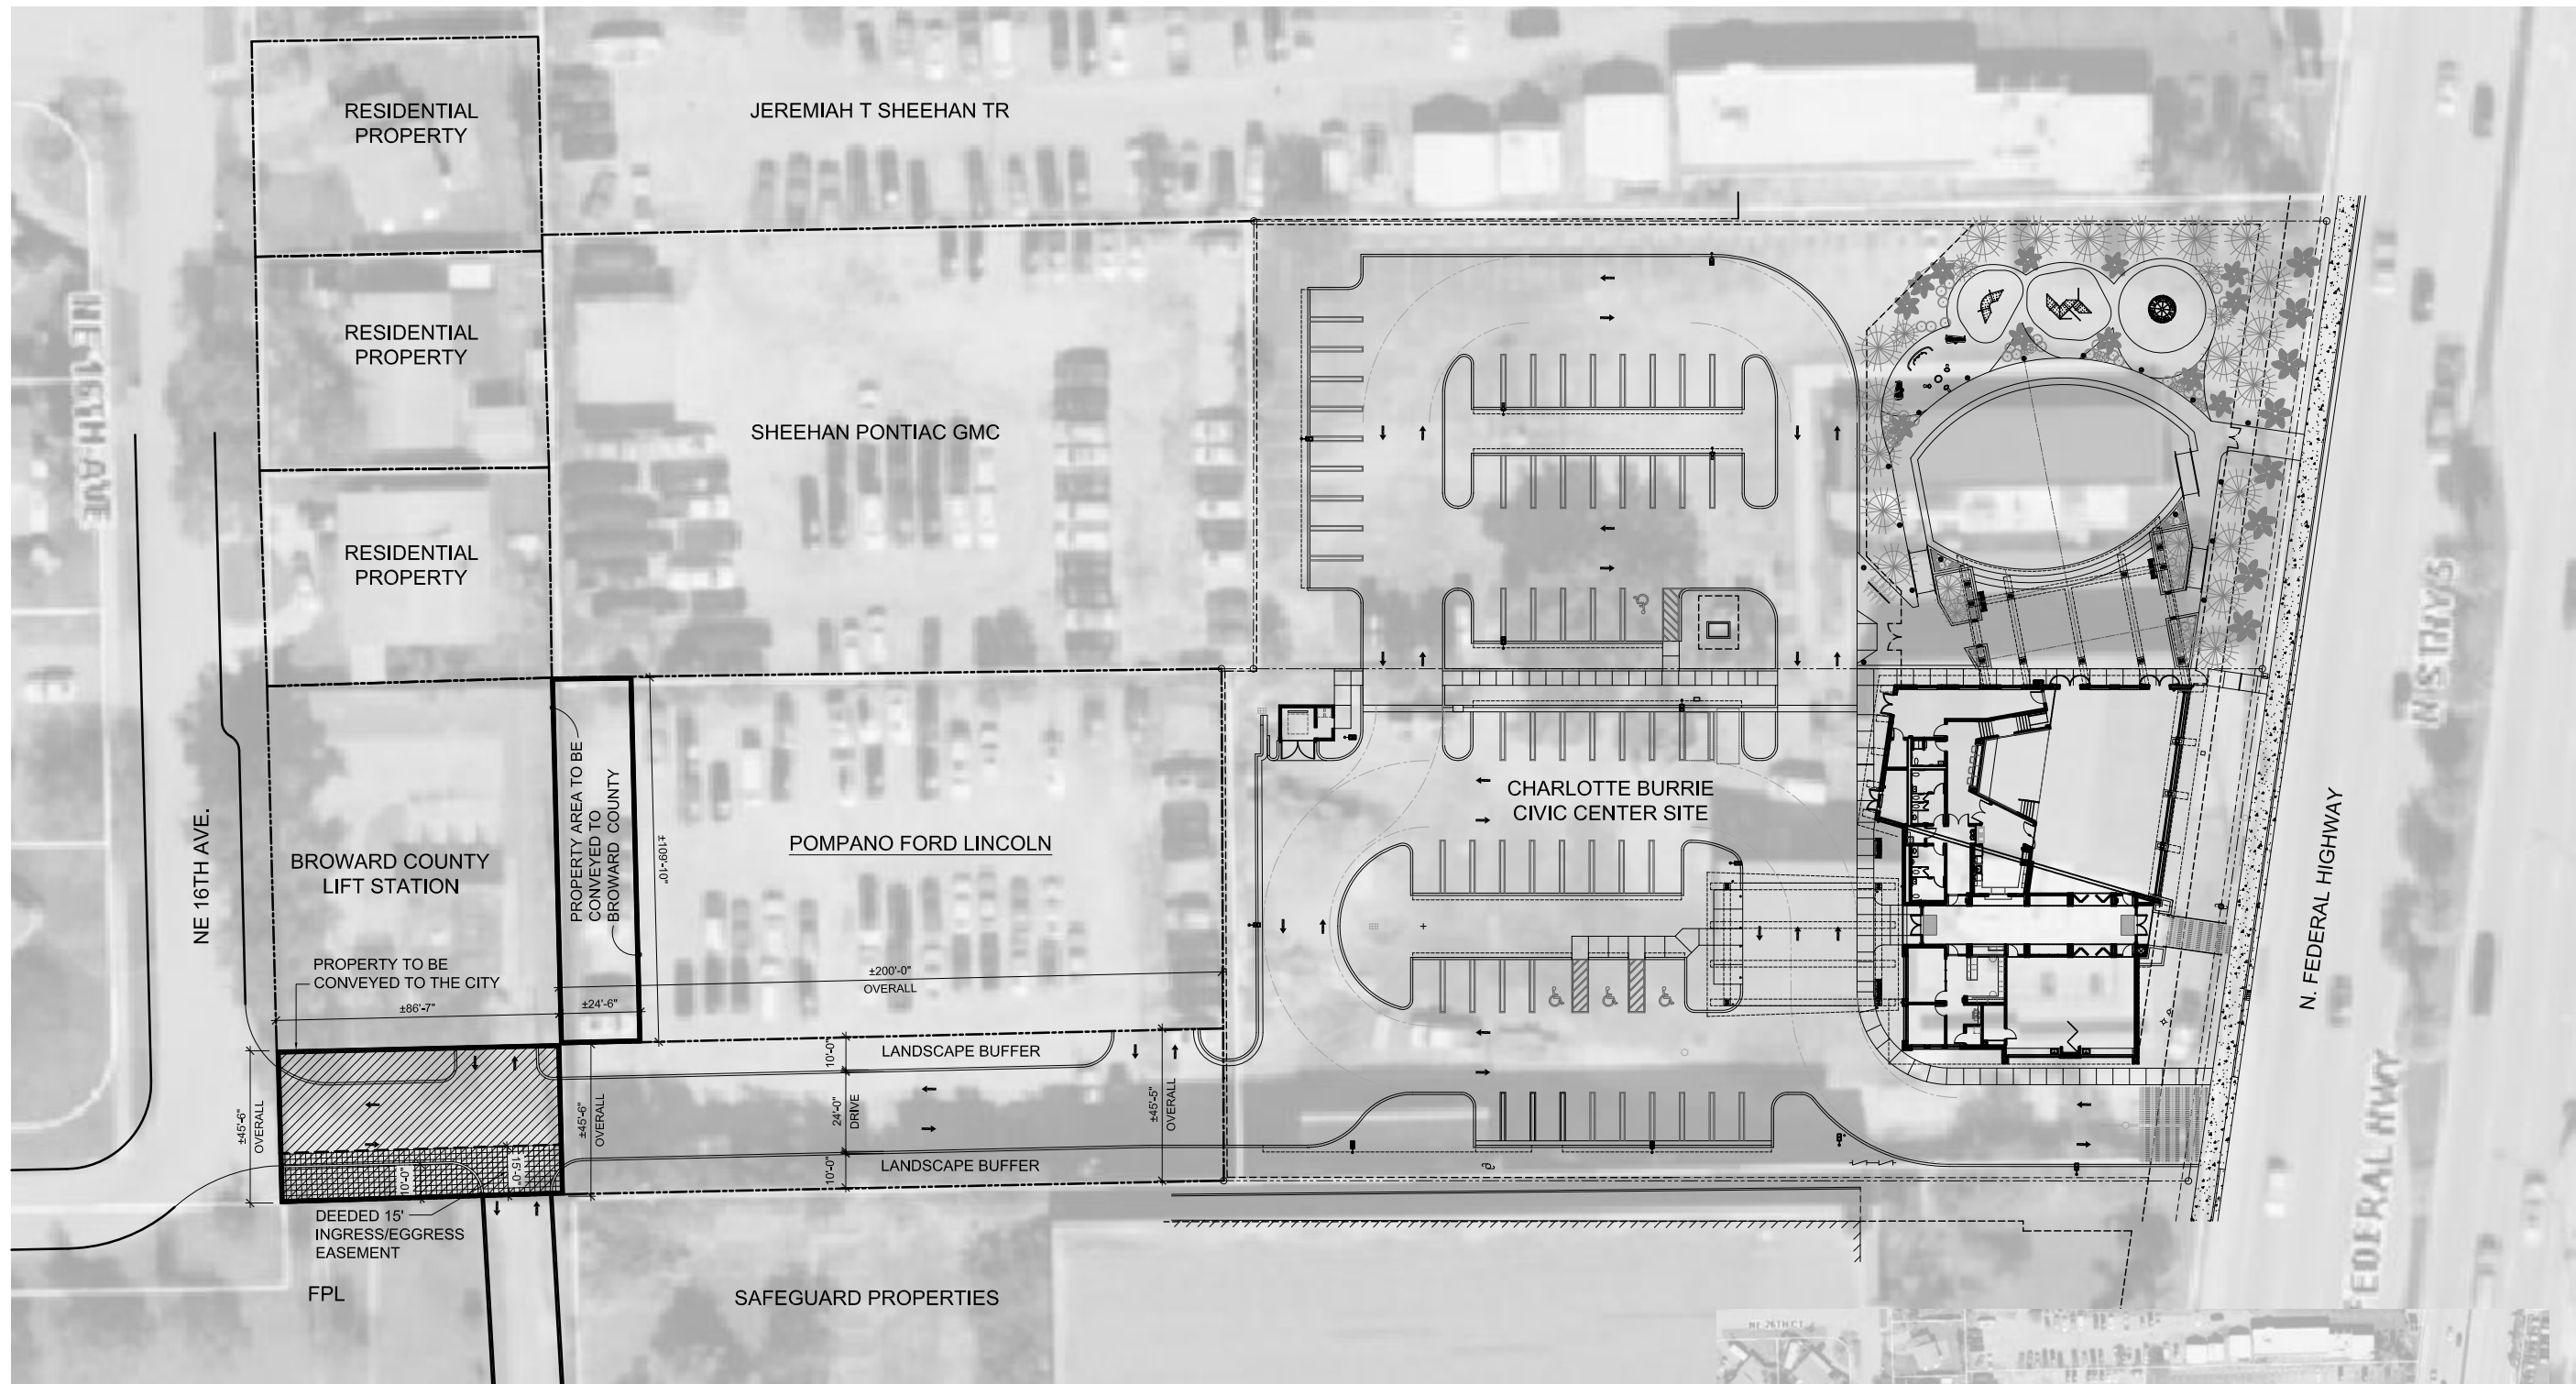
BURRIE CENTER ACCESS ROAD AND PROPERTY TO BE EXCHANGED
